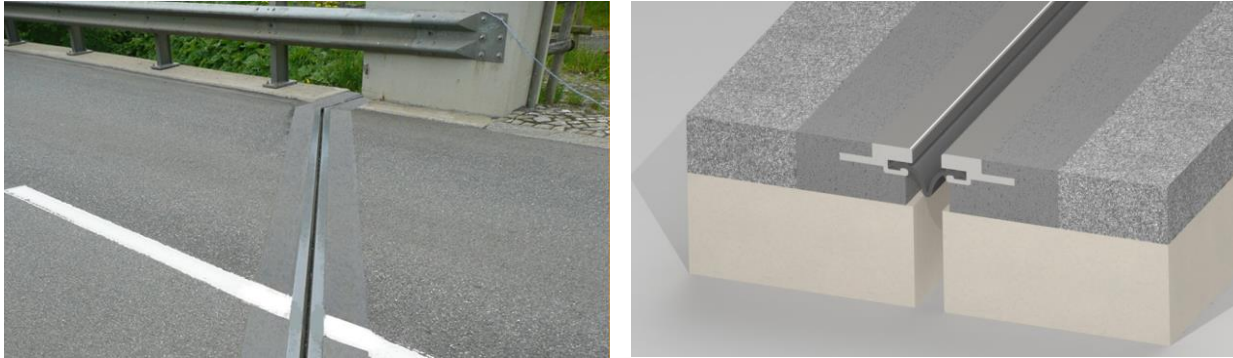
A *Tensa-Crete* single gap expansion joint, with anchorage in high-strength polymer concrete
